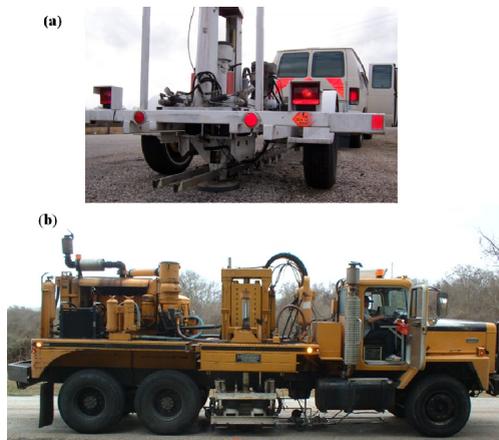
Non-destructive testing methods used in pavement evaluation (a) Falling Weight Deflectometer and; (b) Rolling Dynamic Deflectometer
